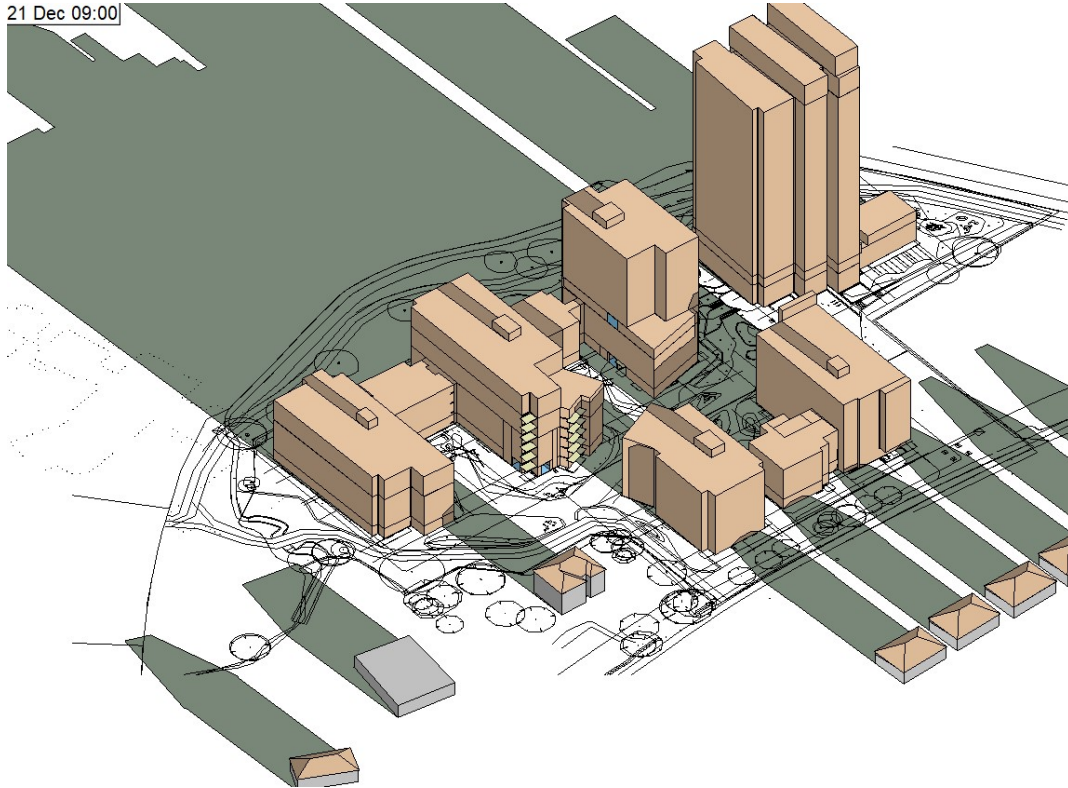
Shadows on 21<sup>st</sup> December at 9:00 – no shadows on the adjoining dwellings
